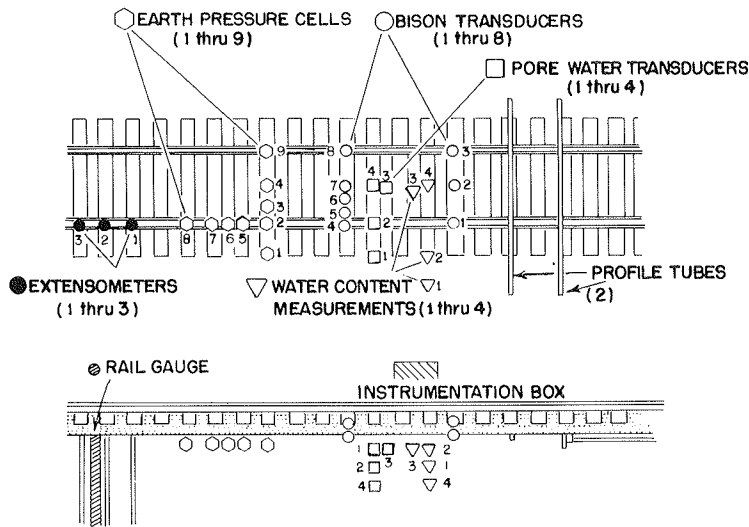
Schematic diagram showing typical subgrade test instrumentation.
